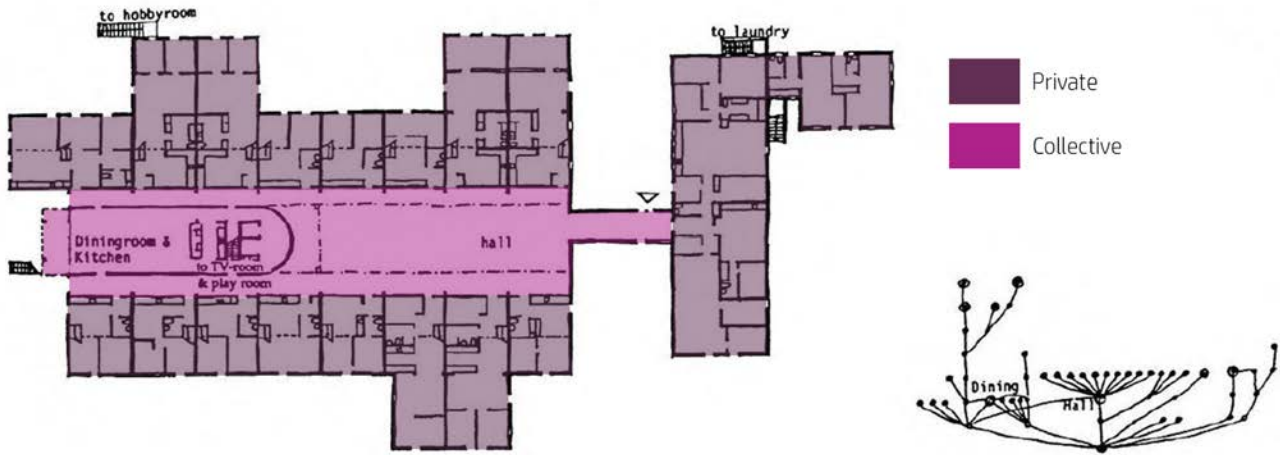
'Jernstoberiet', Sweden; introvert floor plan + graph of (semi-) 'ring-road' layout of the transition zone (Lindén, 1992) (coloured analysis by author)
